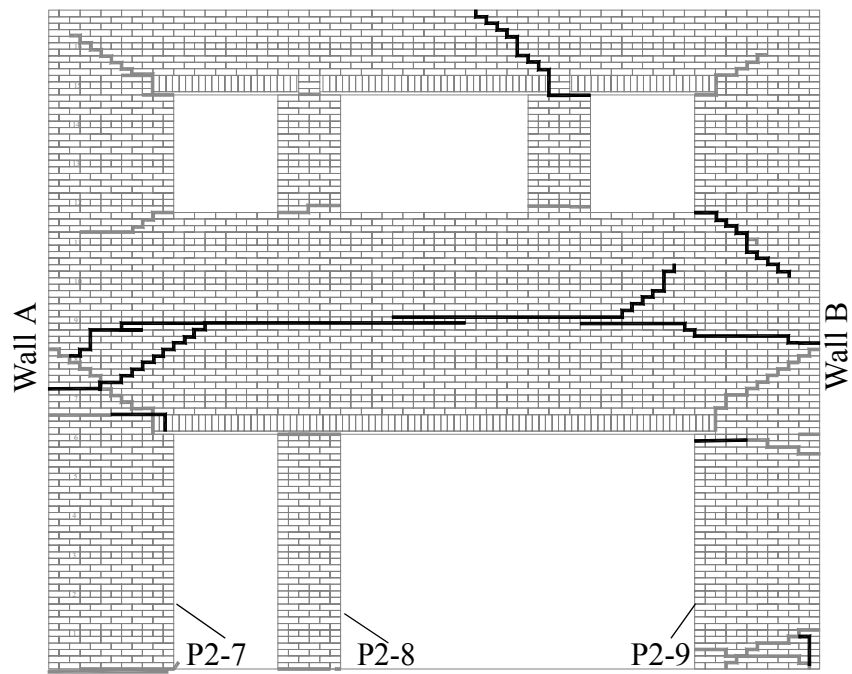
Crack pattern of Wall 2 following Test Run 26.
